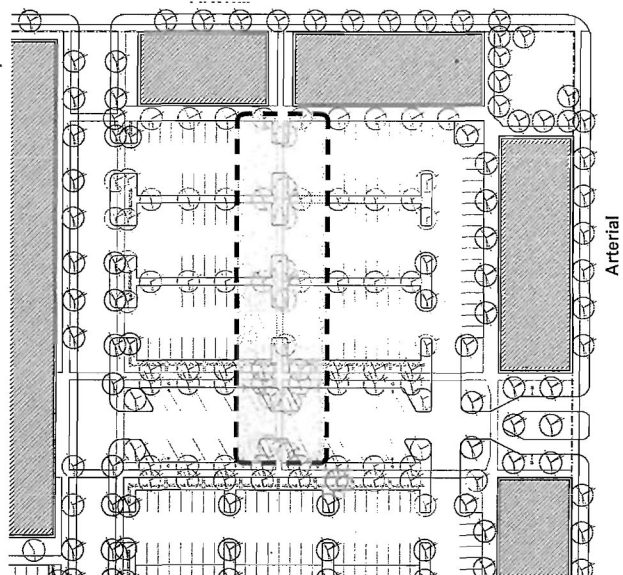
D.8: Site diagram illustrating a parking area walkway perpendicular to the parking drive aisles. The walkway extends 3 parking modules and crosses a primary internal drive.
